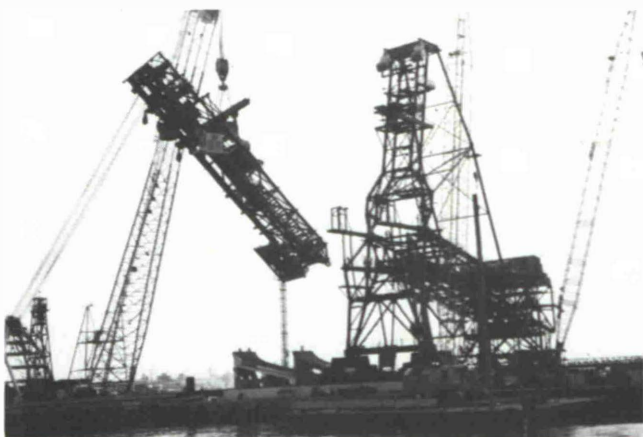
300 ton boom assembly being positioned for connection to bridge
